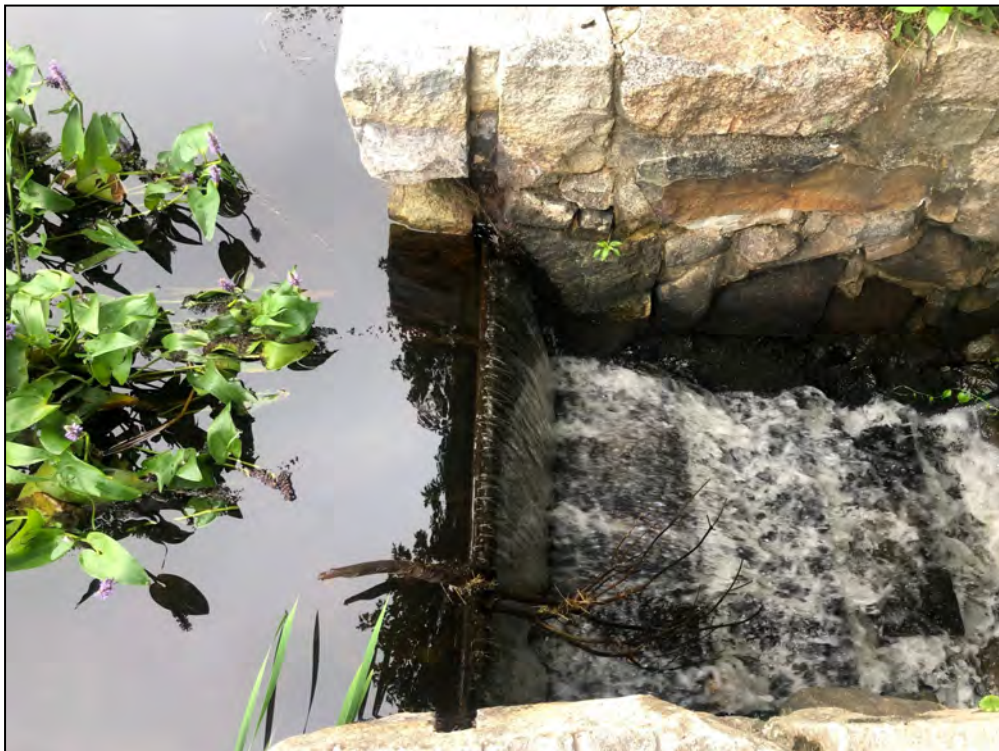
Approach and overview of the spillway. Note vegetation and debris.
